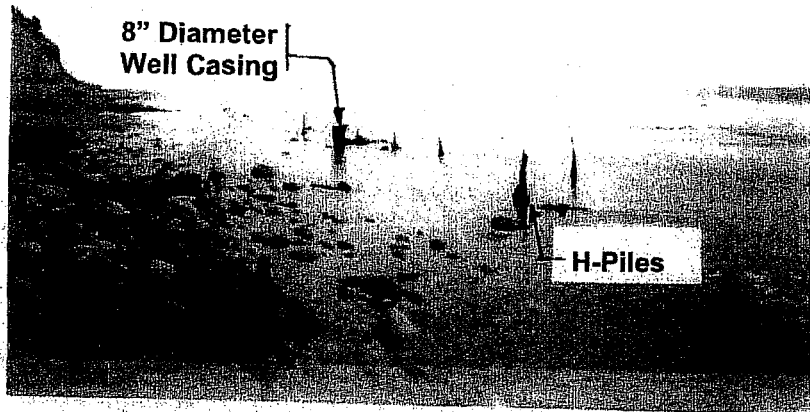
CLOSE-UP HAZARD SITE #10, CAMERA FACING SOUTH (MVC-109F).
